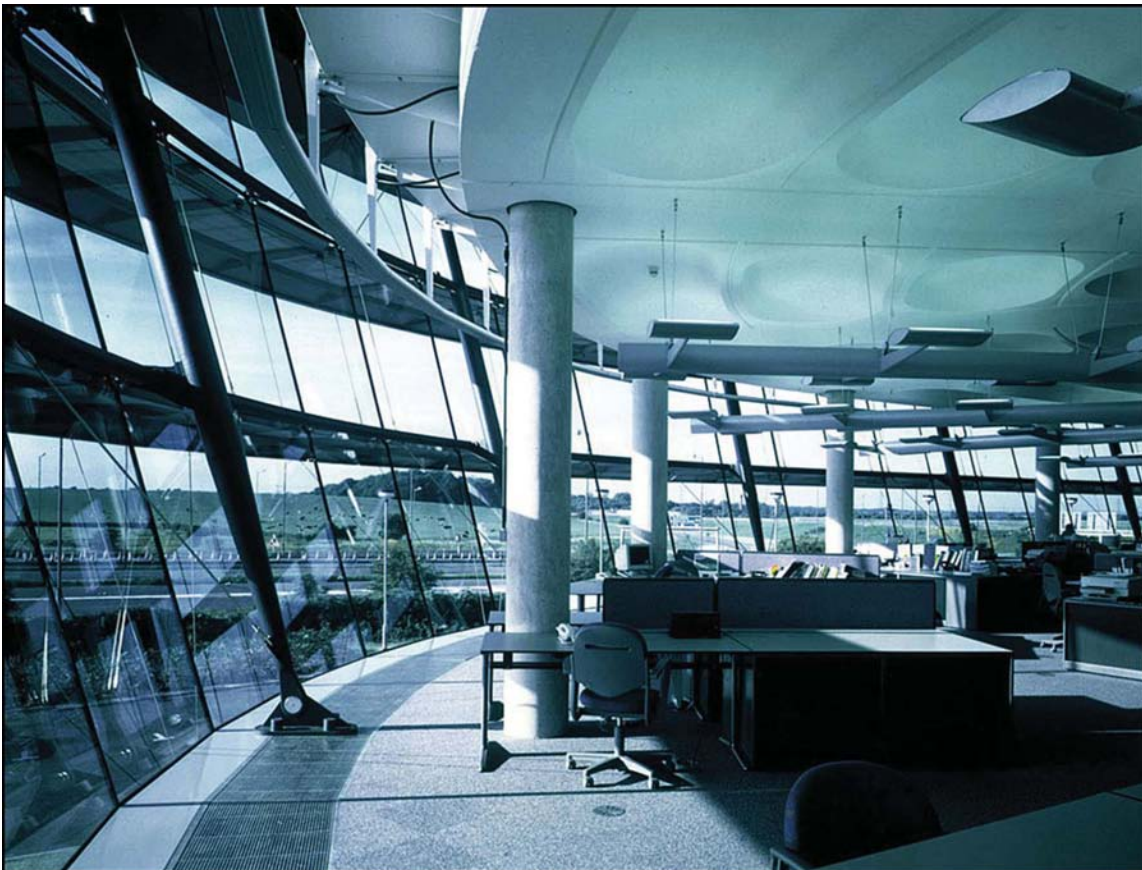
Glass cladding fixed to a steel sub-frame in a reinforced concrete structure. Arrangements such as these need careful co-ordination of design and construction disciplines to develop appropriate connection details to deal with tolerances and fit
